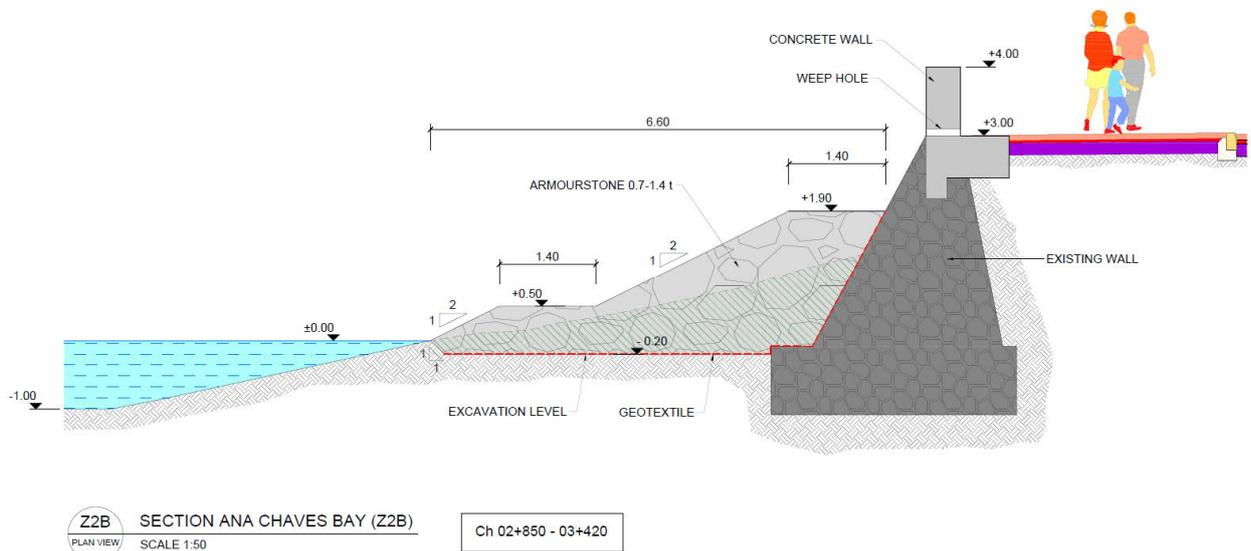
Typical cross section Z2B. Ana Chaves Bay
